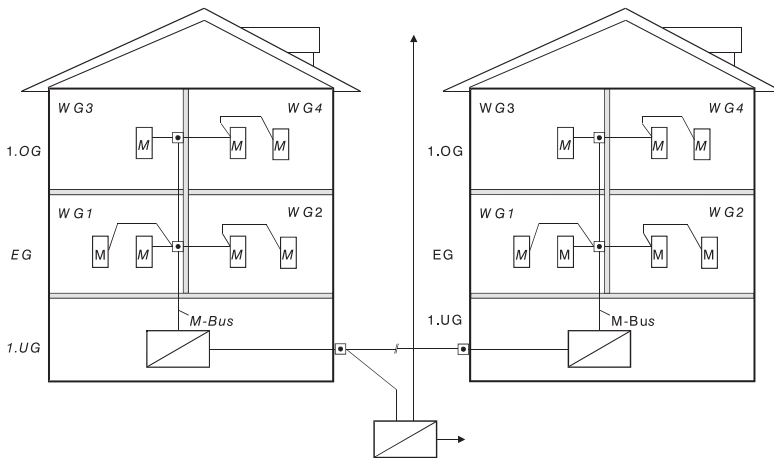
Hybrid system. Details as in Figure 2.5-8
